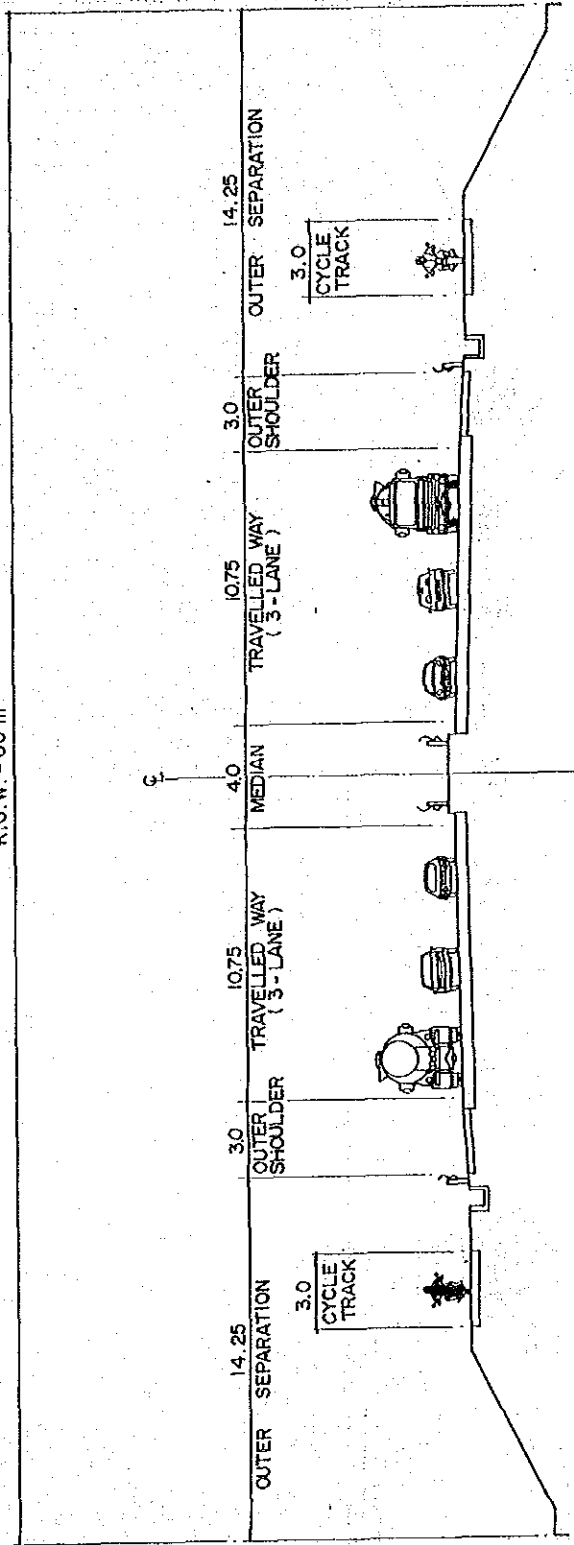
TYPICAL CROSS-SECTION FOR 6-LANE WITH CYCLE TRACK AND FRONTAGE ROAD
